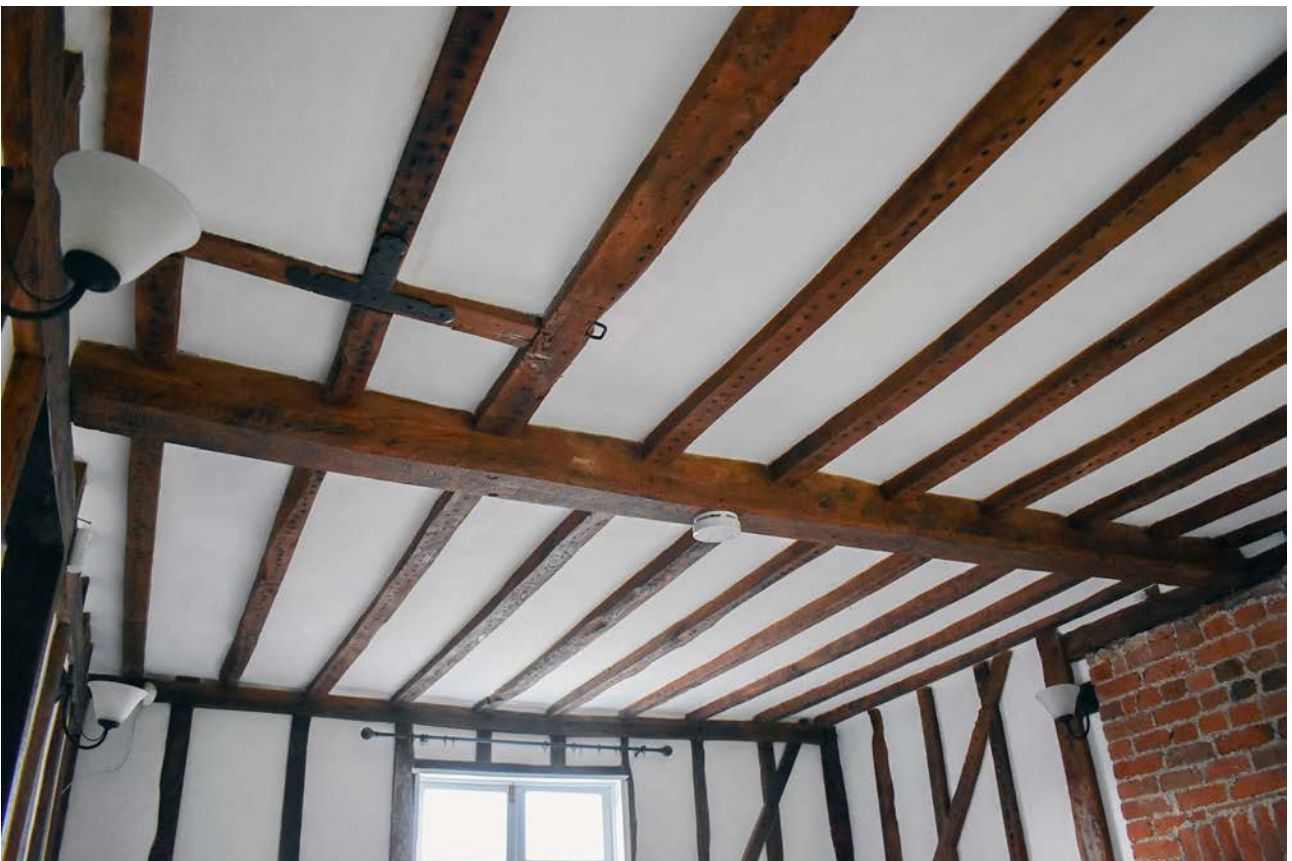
Ground floor, living room, south-east corner of ceiling with trimmer joist
